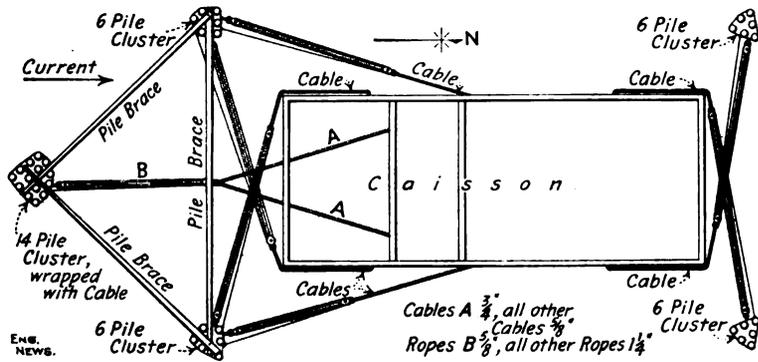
ARRANGEMENT OF PILE CLUSTERS AND MOORING CABLES FOR SETTING THE CAISSONS IN POSITION.
